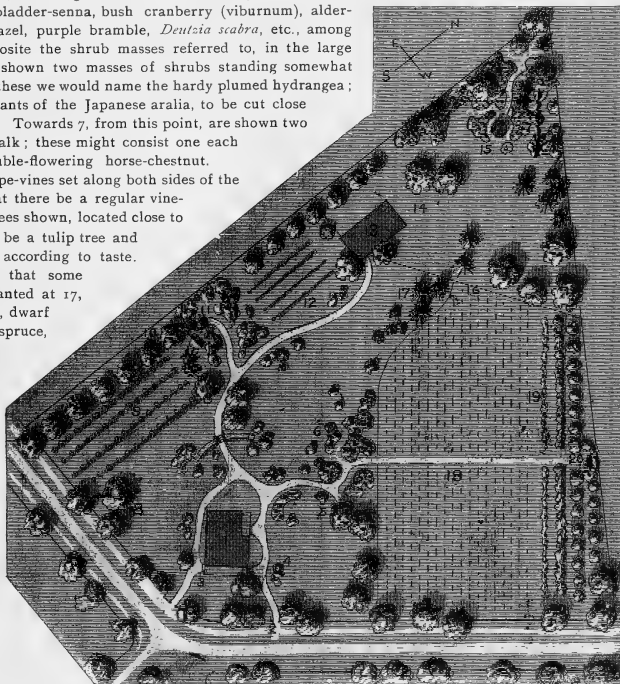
IMPROVED PLAN FOR PLACE IN NEW HAVEN COUNTY, CONN.
